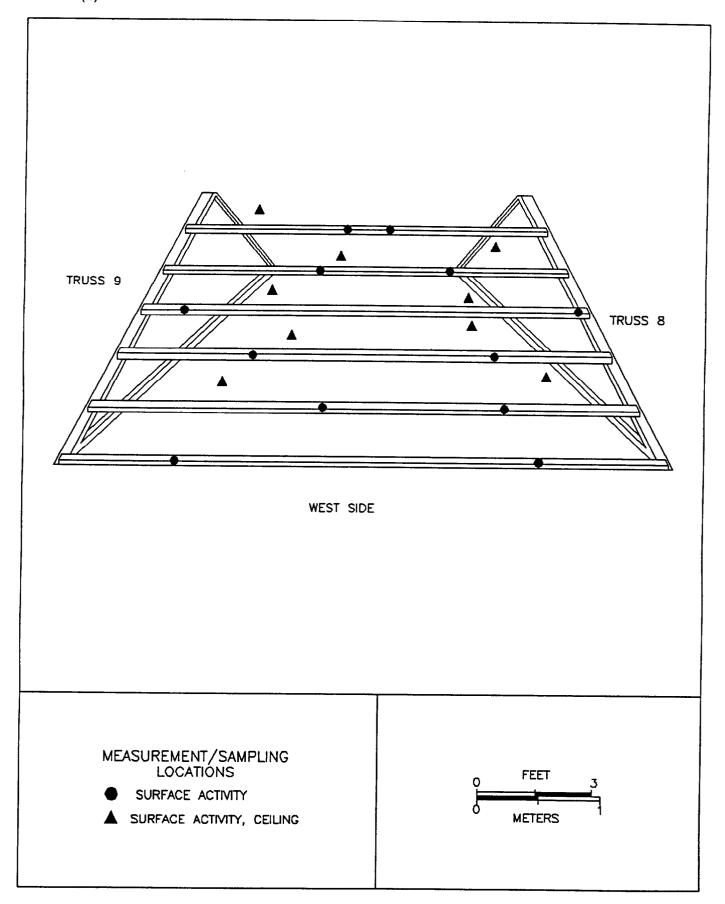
Building 3, Bay 8, West — Measurement and Sampling Locations
